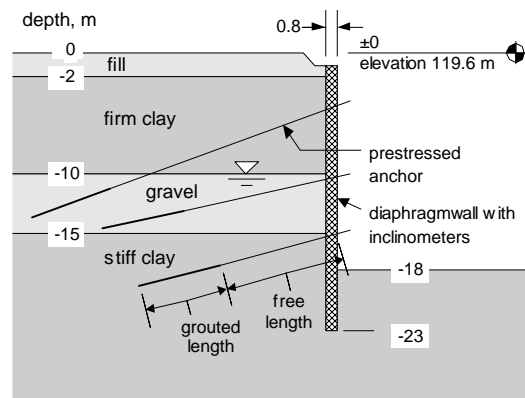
Diaphragm wall cross-section (Szavits-Nossan et al. 1999).
